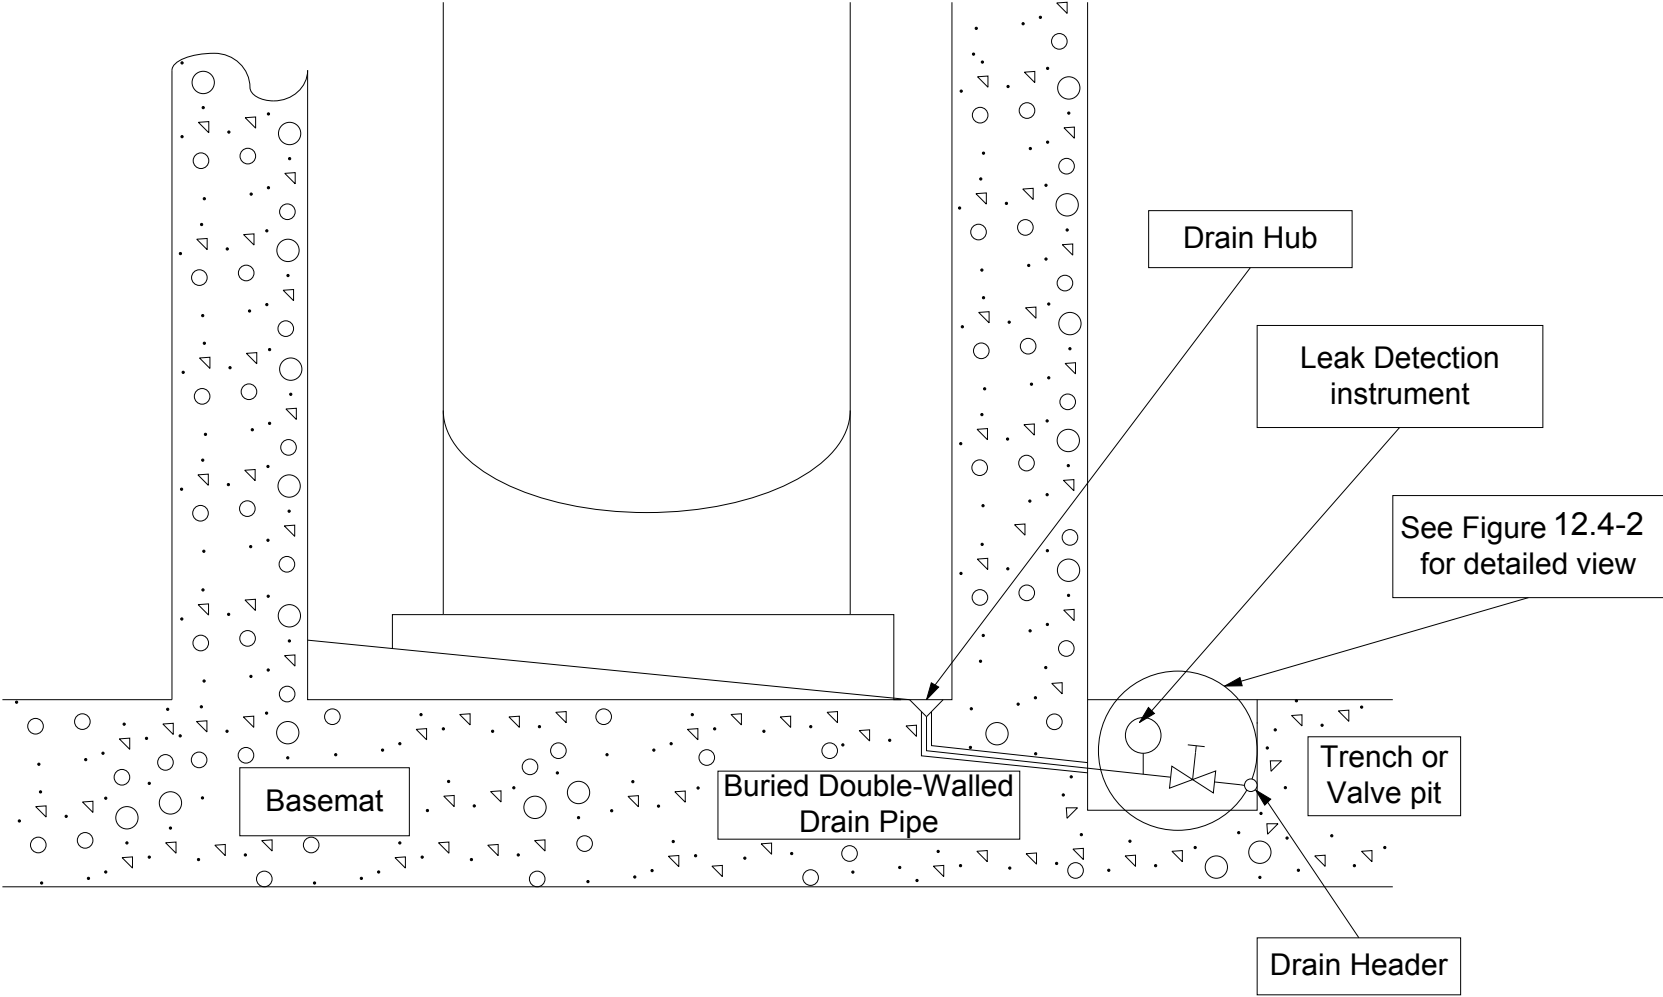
Typical Design Details of Drainage and Leak Detection Configuration
